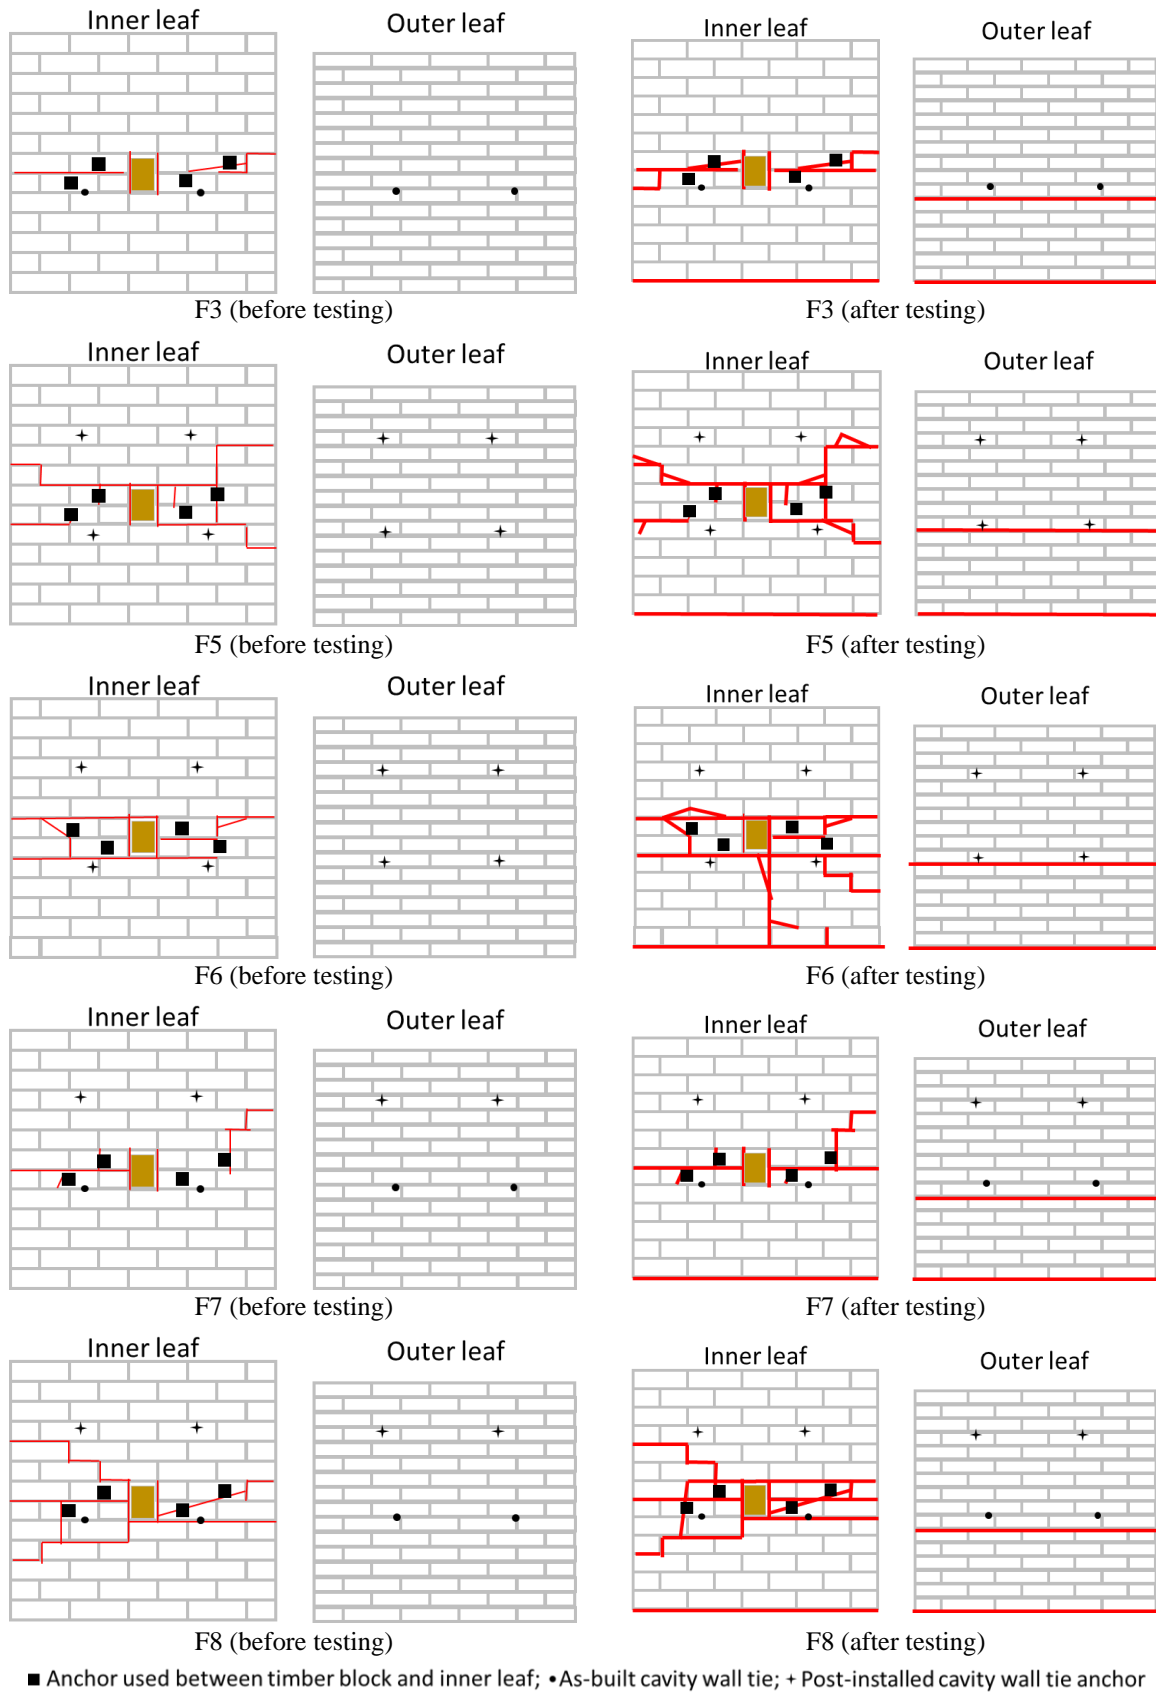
Crack patterns of the strengthened specimens after strengthening (left diagrams) and testing (right diagrams).
